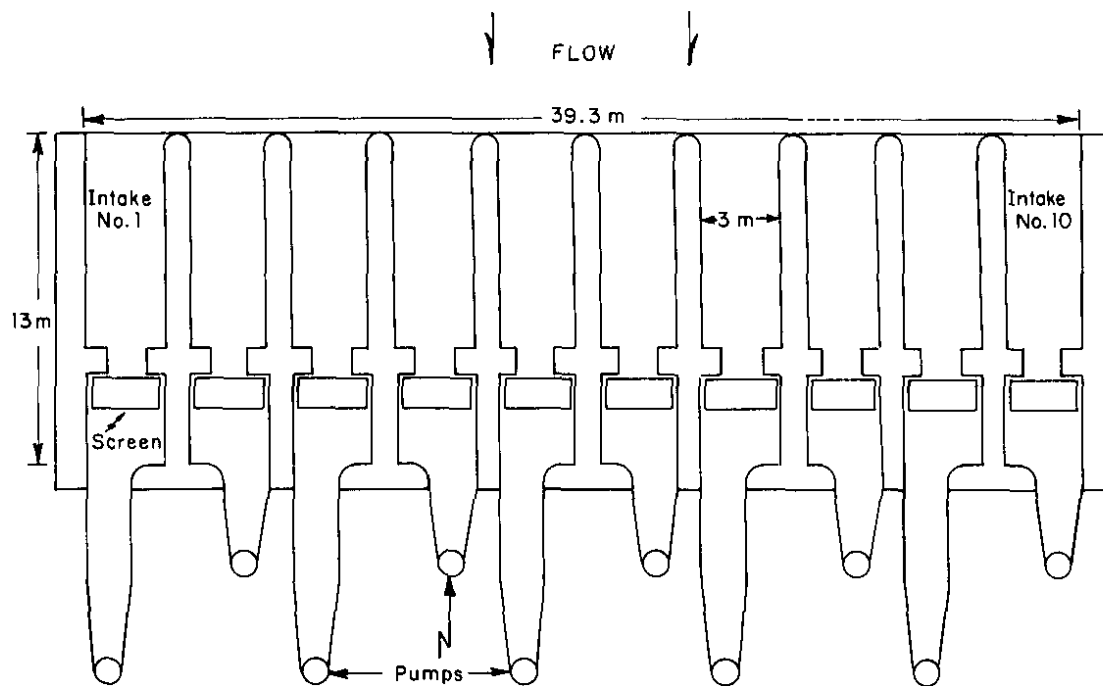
Schematic of 1G and 3G Pumphouse Intake, Plan View
